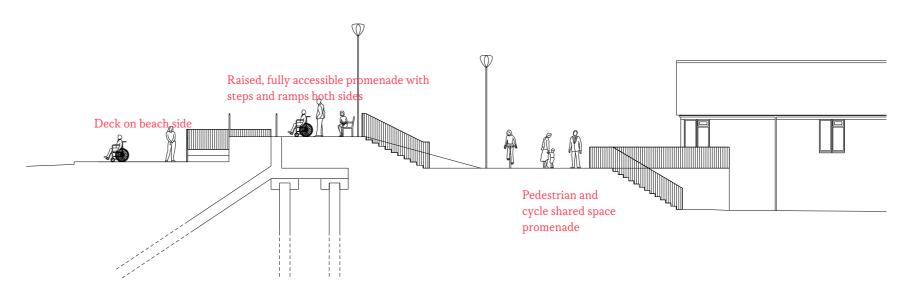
Indicative cross-section showing the design approach to the Village seafront.
